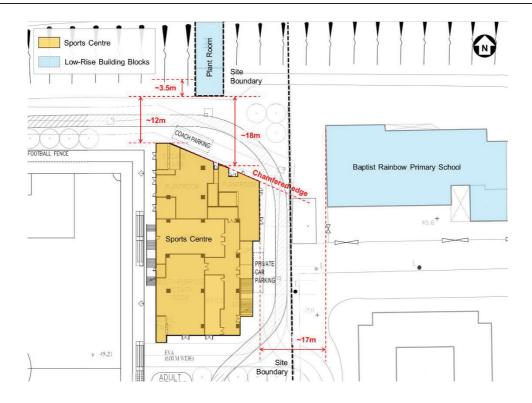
Layout Plan of Sports Centre at Ground Floor Level under <u>Approved S16</u>
